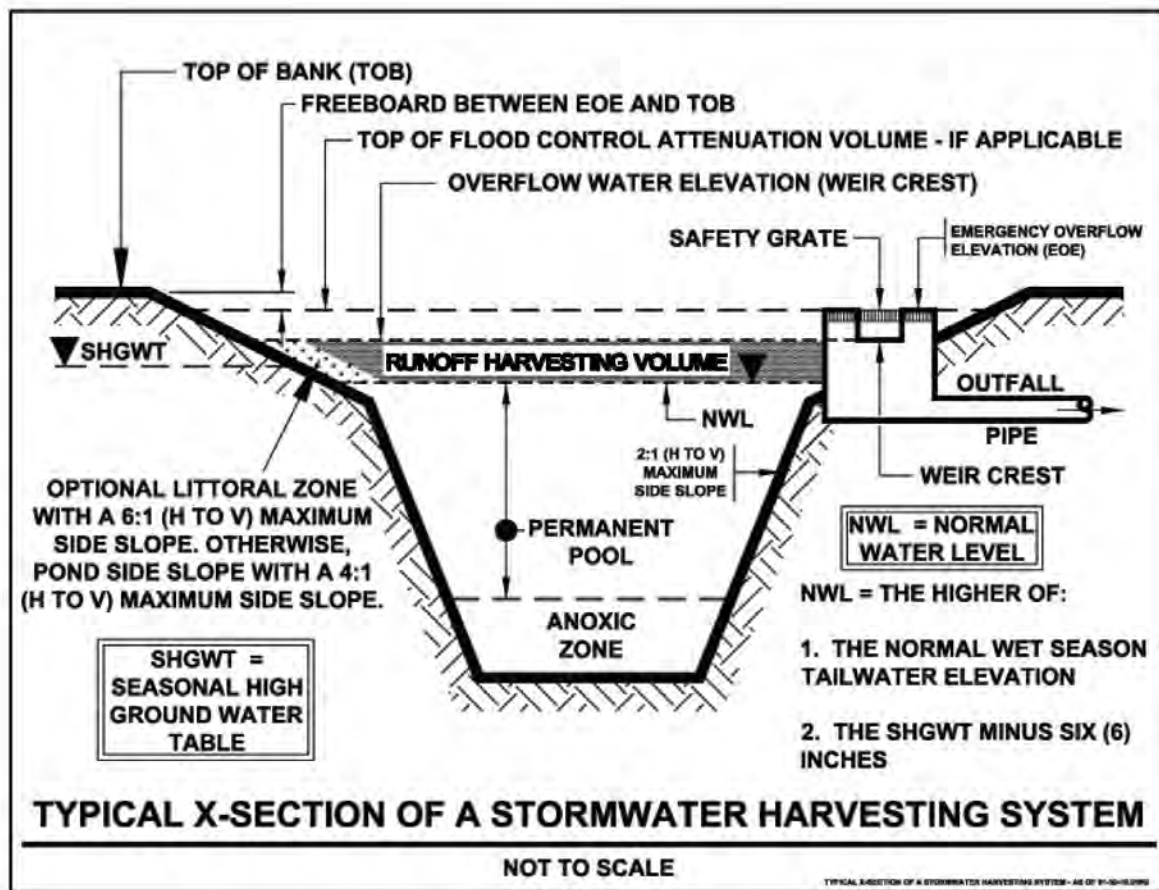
Typical Cross Section of a Stormwater Harvesting System
